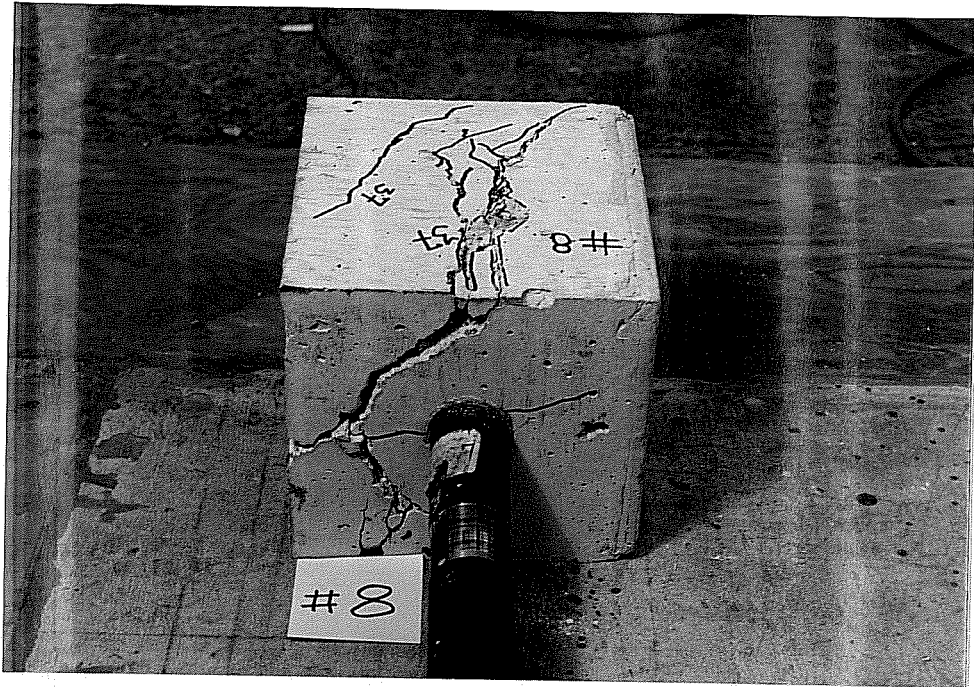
Final appearance of a specimen with 40 MPa concrete
